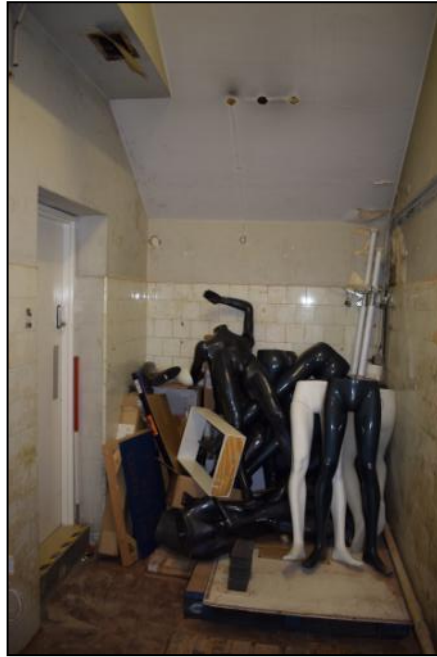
Former bathroom facilities, at basement level (Scale 1m)
